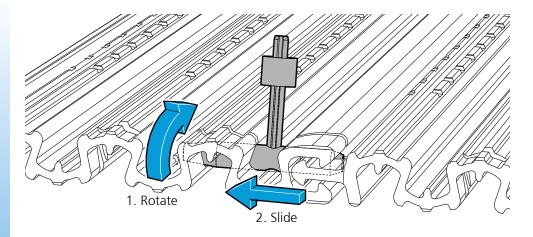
(C90) Lift and slide these Locking Bolts / TamperProof Locking bolts into the open position
